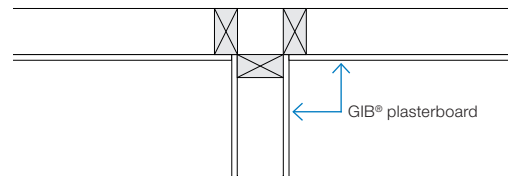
GIBFIX® FRAMING SYSTEM INTERNAL WALL INTERSECTION
